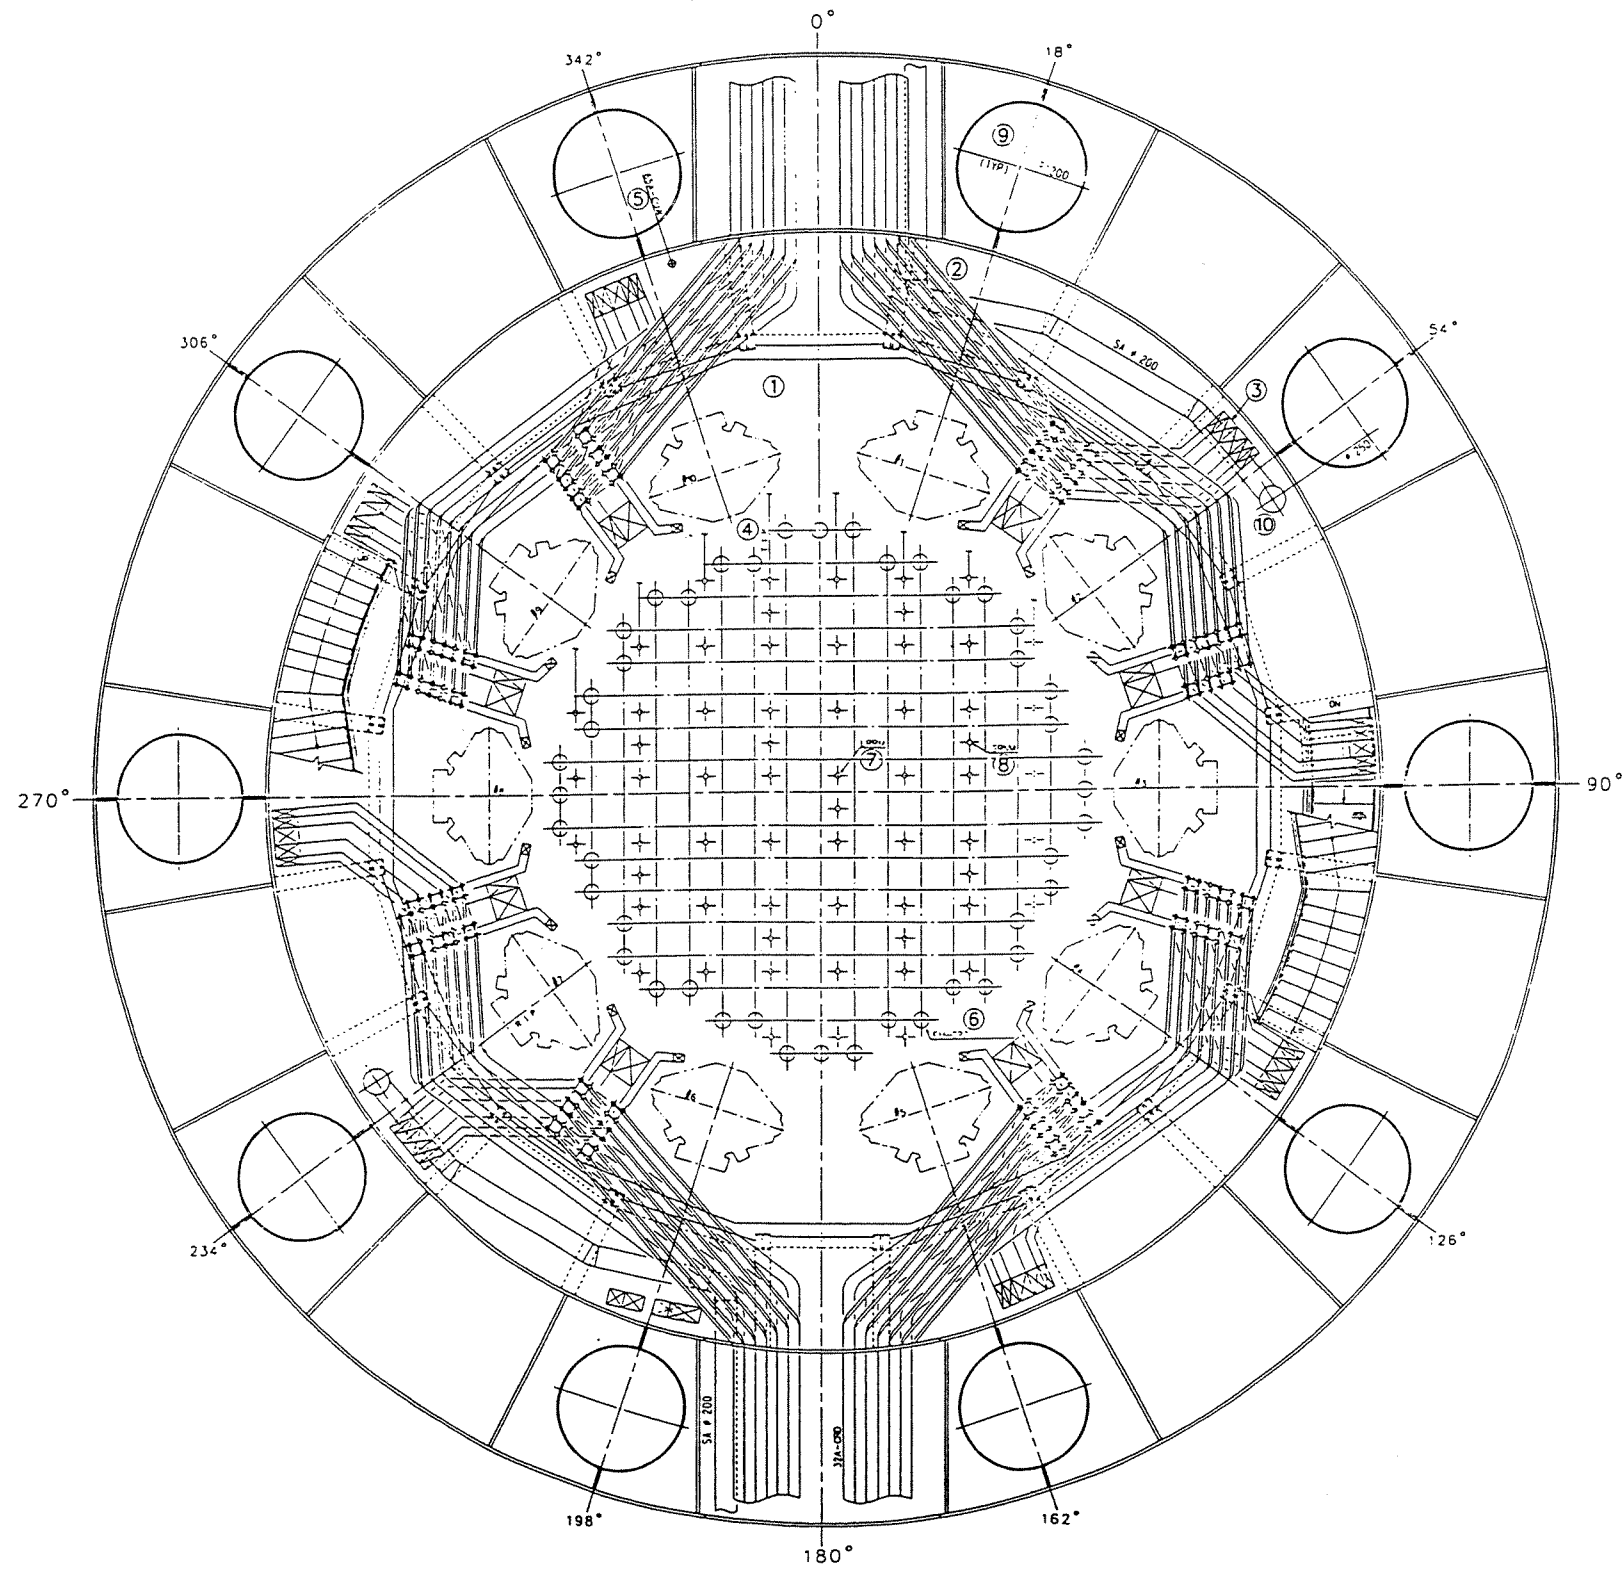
DRYWELL STEEL STRUCTURE AT EL. 18100 mm
